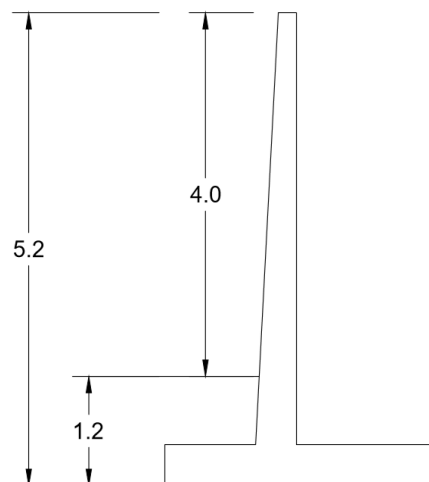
Cantilever retaining wall (Overall depth of wall)
